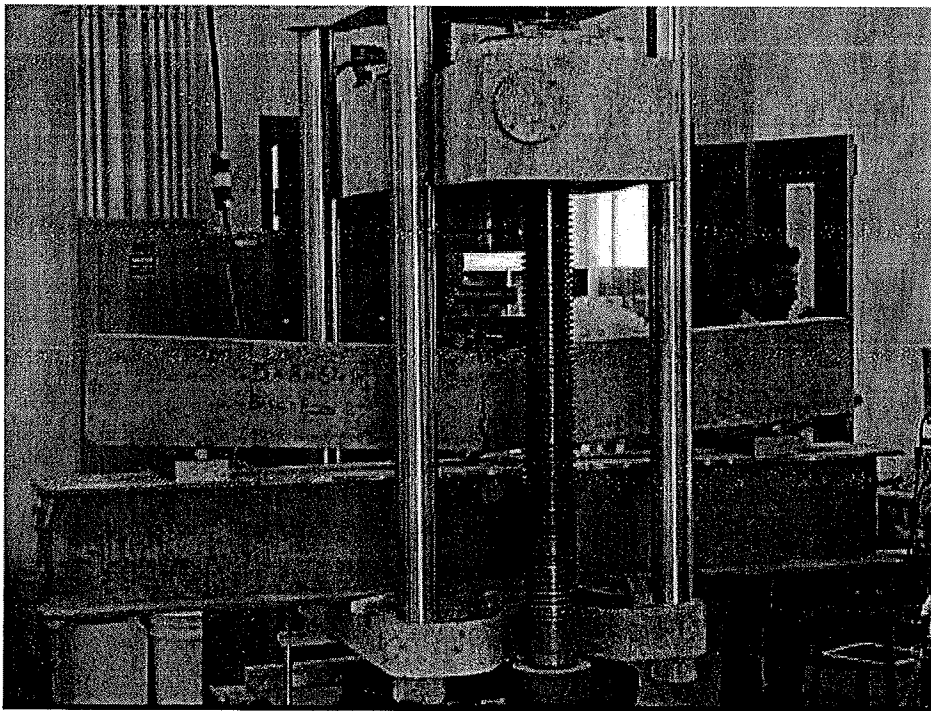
Deflected BRC-4 beam with flexural crack, still carrying load.
